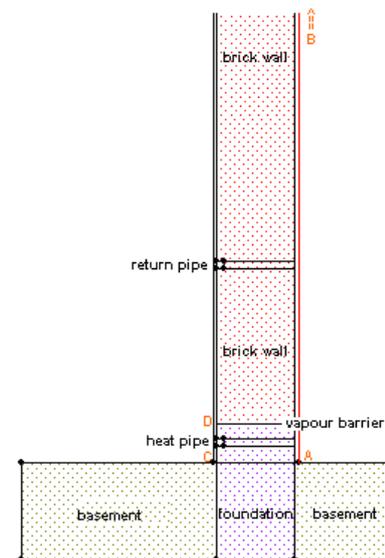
Implemented construction to calculate hygrothermal processes in case of wall heating of building components as in the example of the Renatus Chapel.
